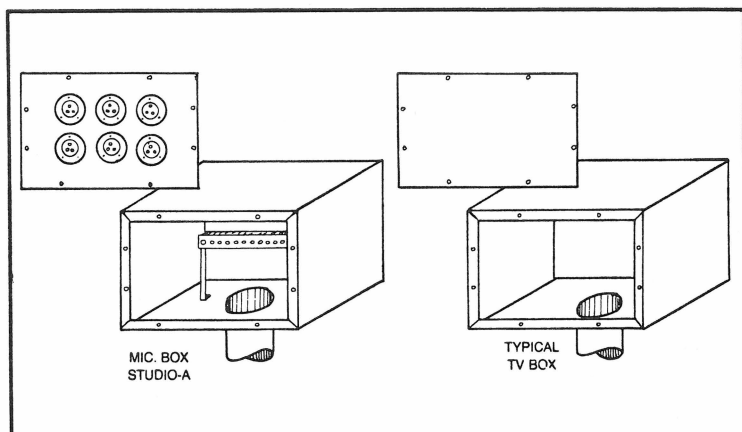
Conduits are terminated in boxes adapted to audio or television use.
